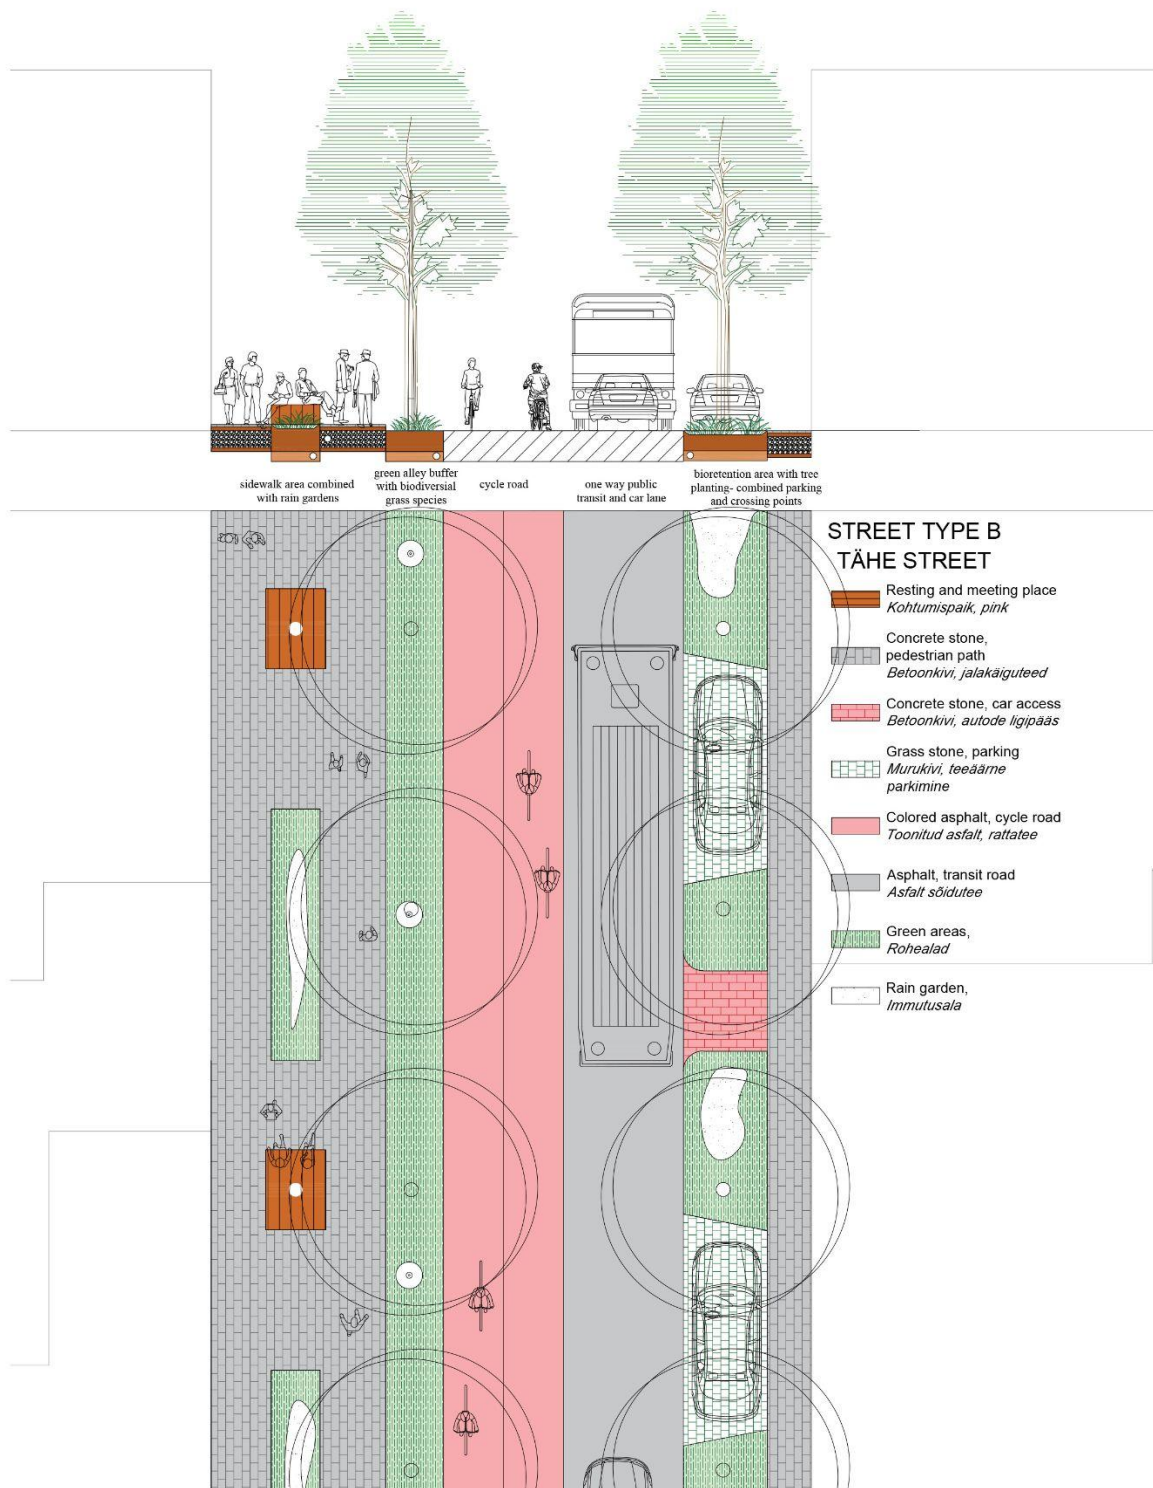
Conceptual section and plan segment of street type B (Author, 2021).
